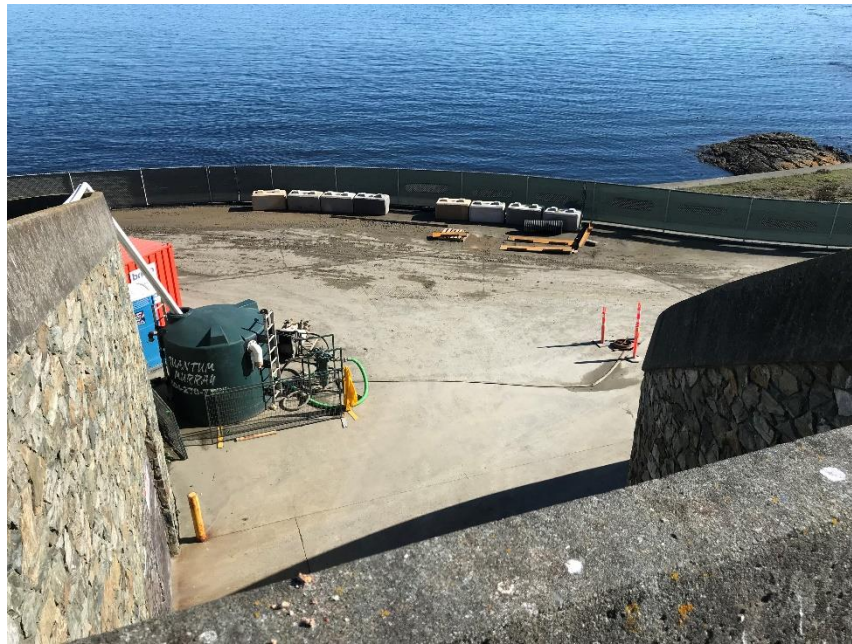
Clover Point Pump Station: Set up of dewatering equipment.
